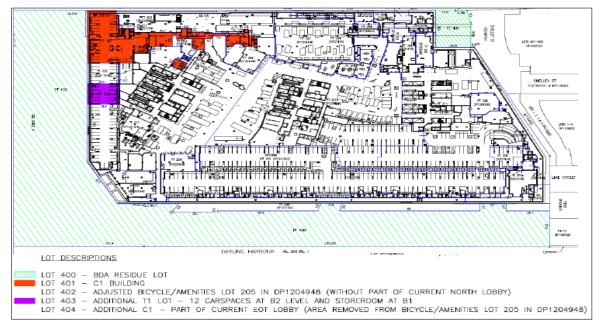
| Basement Level 2 (south) showing proposed Lot 401 (red shading), proposed lot 403 (purple shading) and proposed Lot 400 (green hatching) (Source: Applicant)
